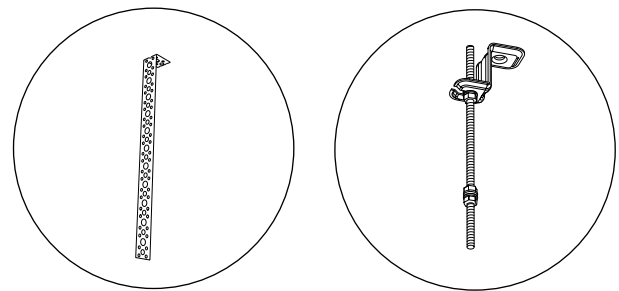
Suspension options with mounting strips and threaded rods respectively.
